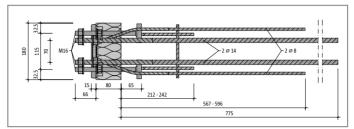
Schöck Isokorb® type KS14-V8: Plan view
